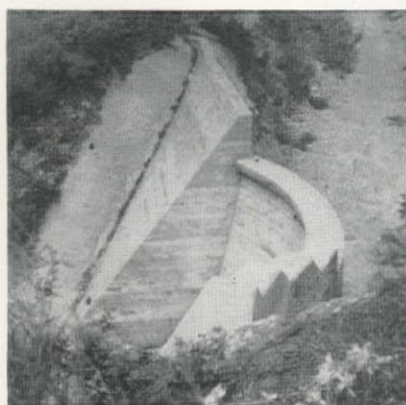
Conventional concrete dam arched to reduce required volume of concrete.
